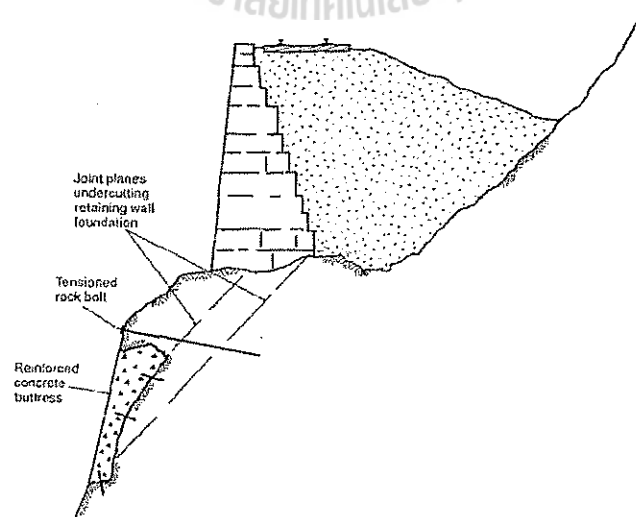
Retaining wall foundation stabilized with reinforced concrete buttress and rock bolts.
